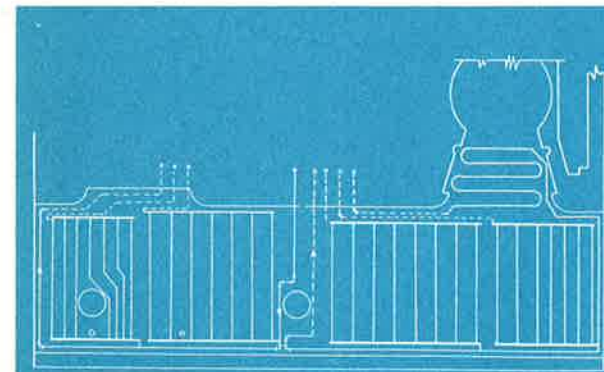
Pipe layout for sidewalk installation at Peoples Savings Bank, Providence, R. I.
